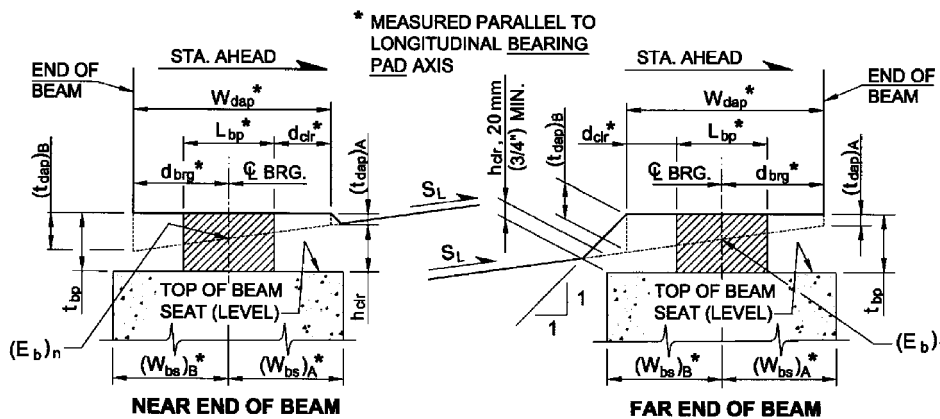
2.4P-1 - Typical P/S Concrete Beam Dap Detail (Viewed Parallel to Longitudinal Beam Axis)
